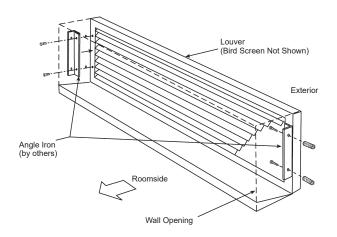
Vertical or Horizontal Blade Wall Intake Louver (Flanged) (Vertical Blade Shown)
